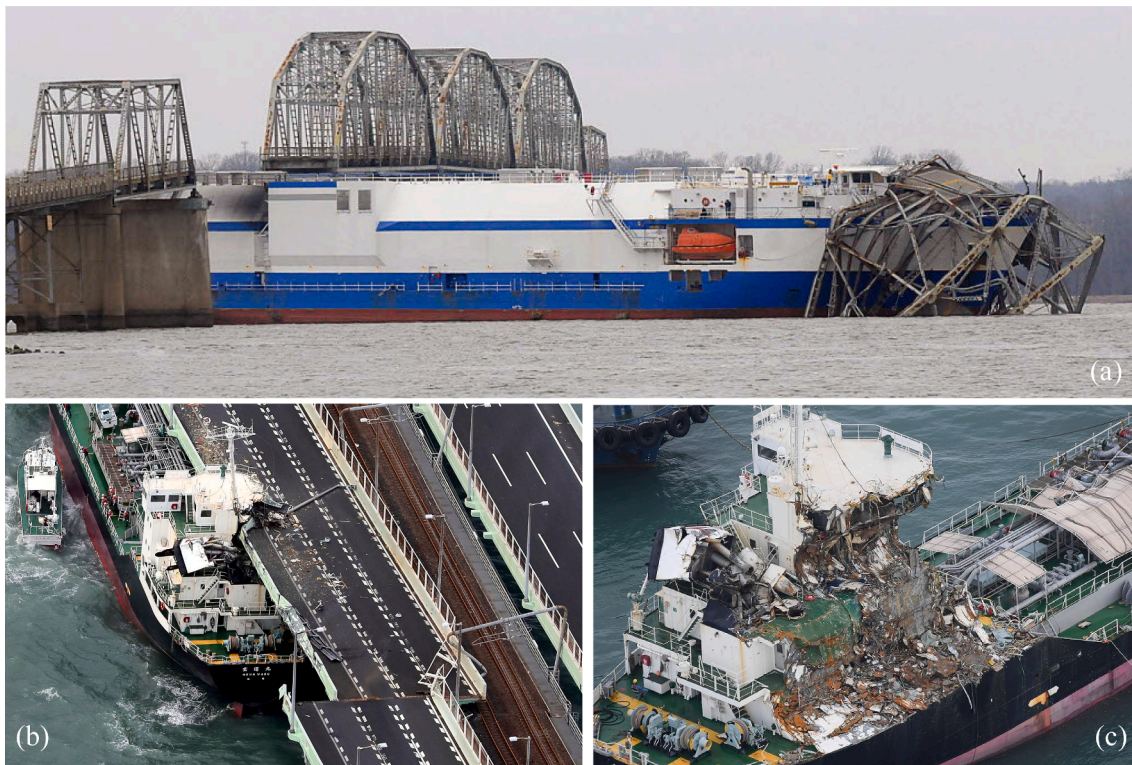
(a) The Friesenbrücke Bridge girder destroyed by a cargo ship [13], (b) Kansai International Airport connecting bridge collide by a tanker, and (c) damage of the tanker [14].
